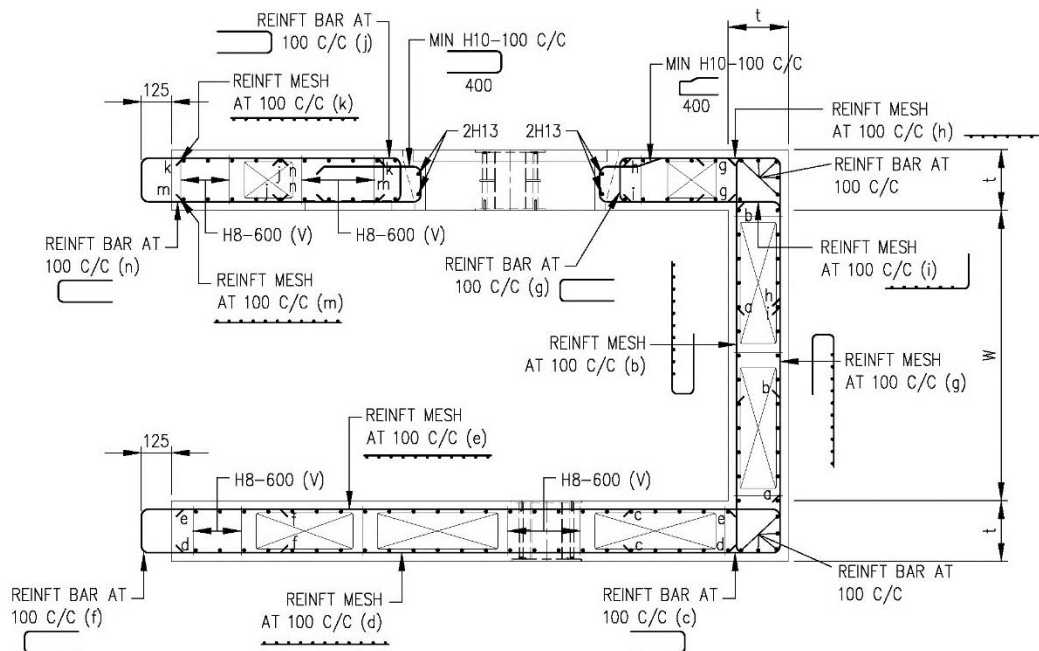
REINFORCEMENT BAR DETAILS OF WALL AND RIB FOR C-SHAPED PRECAST HS
